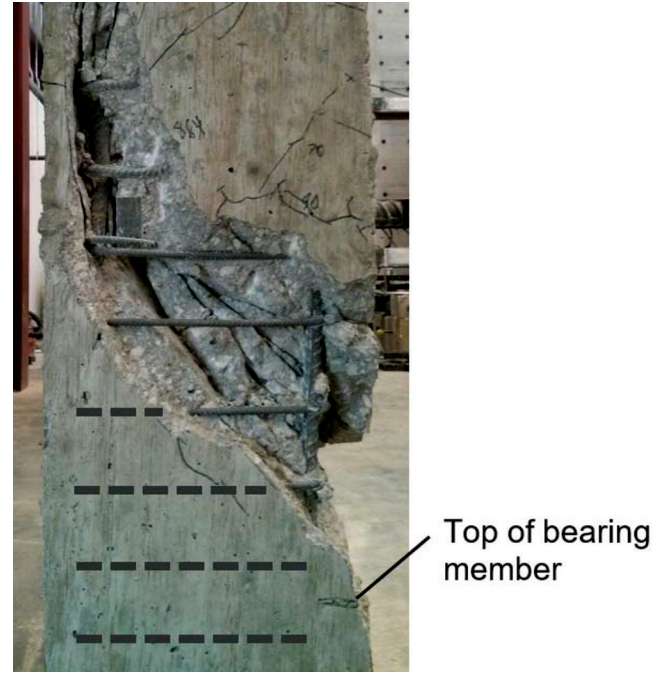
Cracks confined by effective confining reinforcement (Specimen 11-5-F3.8-6#3-i-2.5-3-12).
